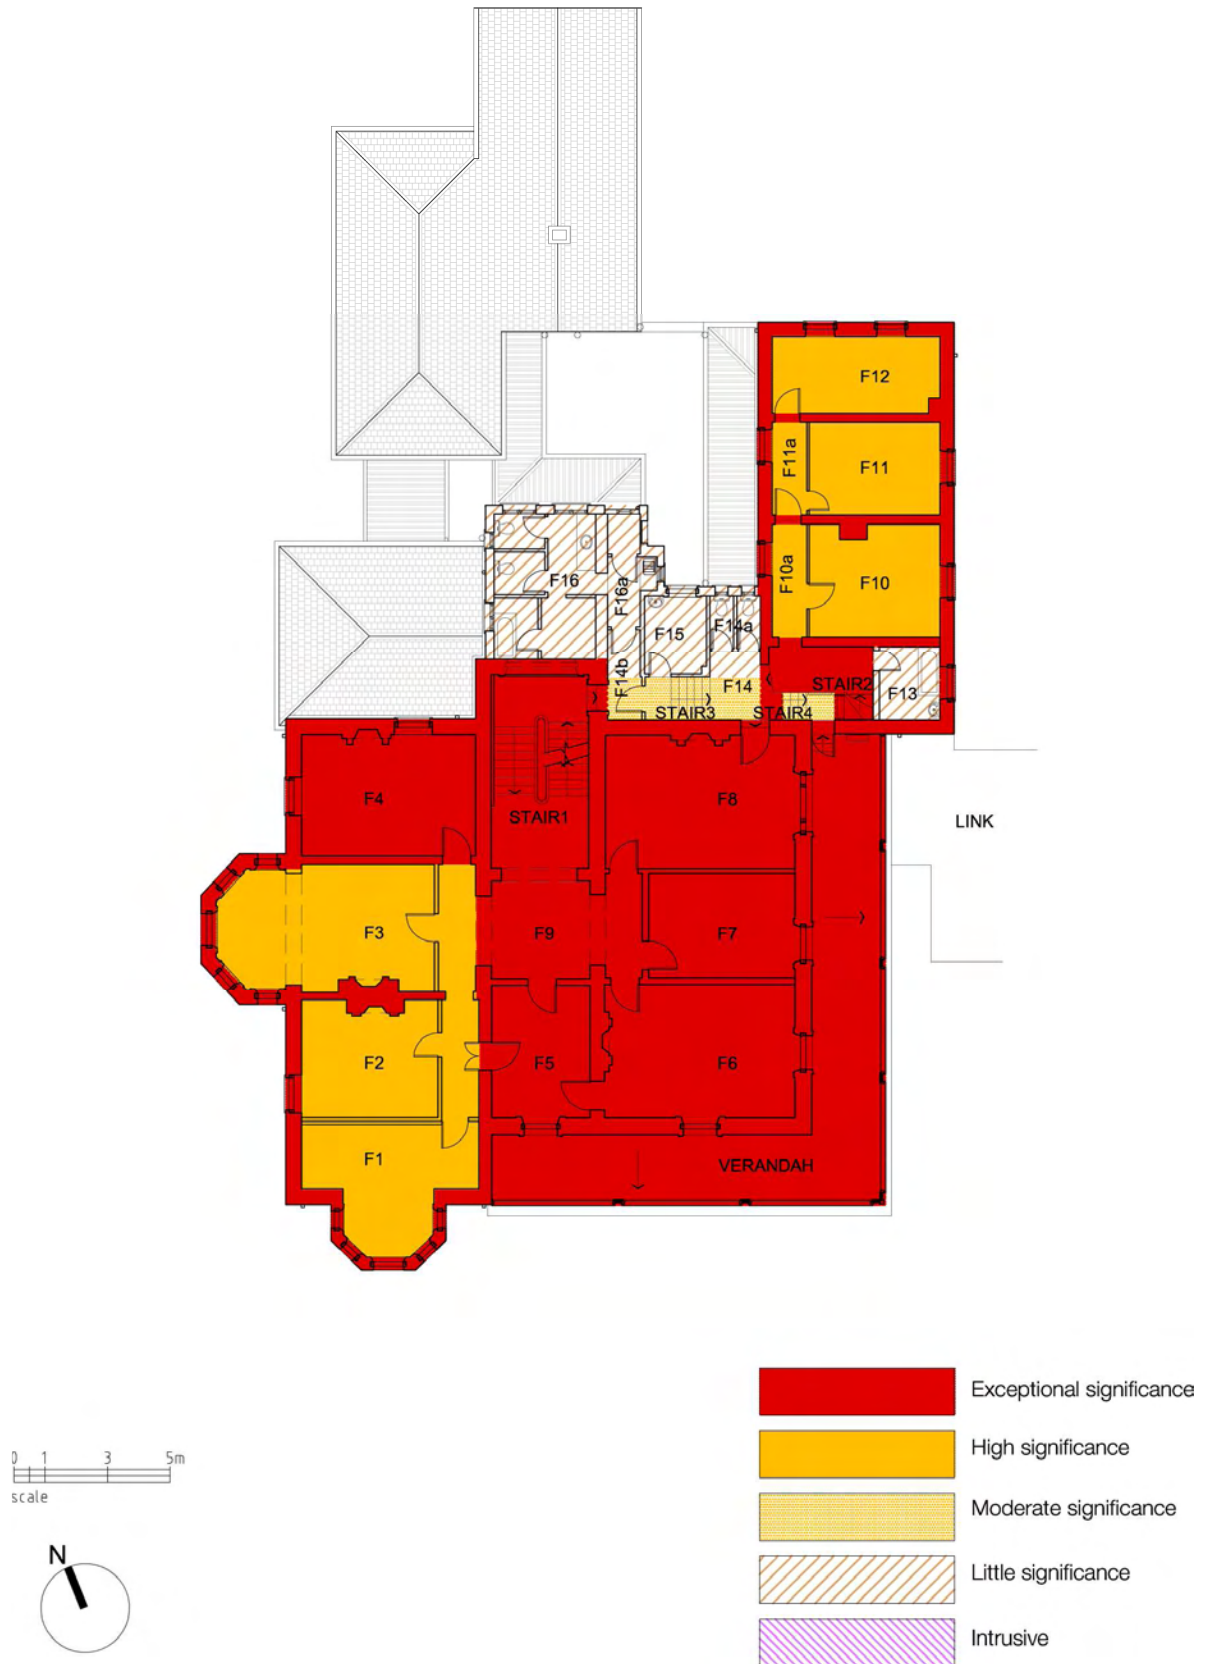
First floor plan of Graythwaite House, levels of significance.
